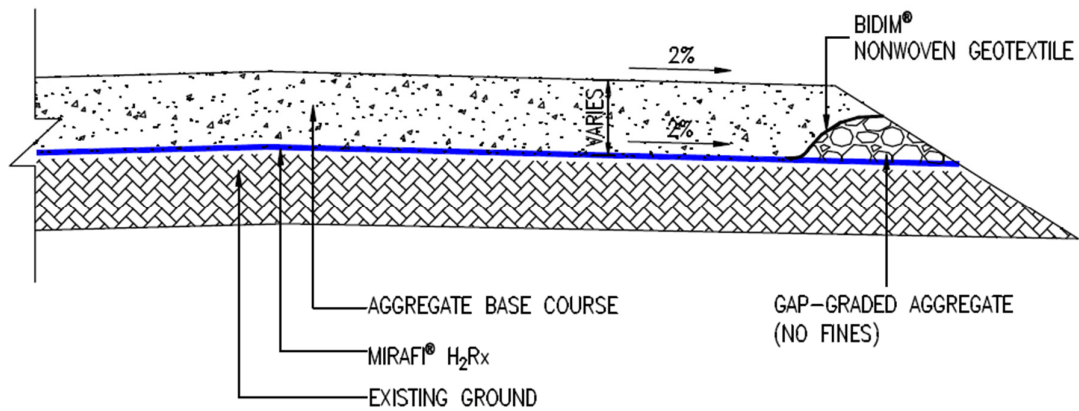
(b): A typical cross section diagram for geotextile edge terminated at side with riprap protection.
